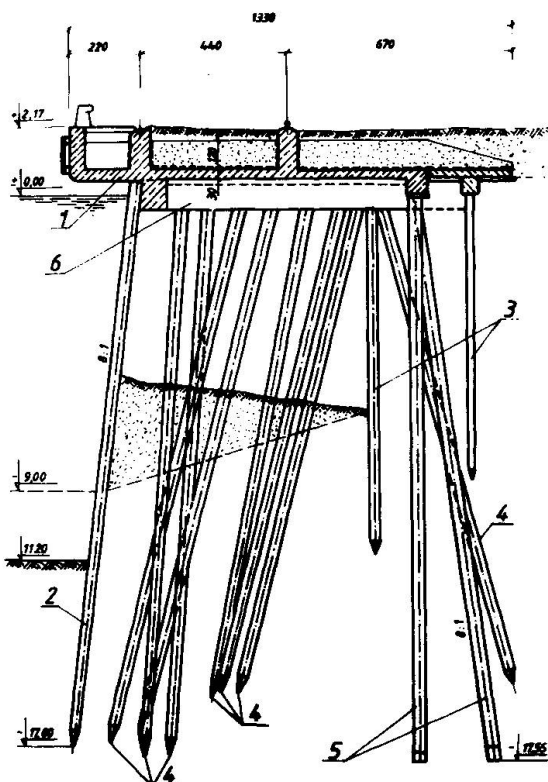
Reconstruction of the Ore Terminal berthing structure in Gdańsk [3]: 1-new reinforced concrete slab, 2-concrete sheet wall, 3-existing timber sheet wall, 4-existing timber piles, 5-concrete piles, 6-existing concrete slab with reduced thickness
